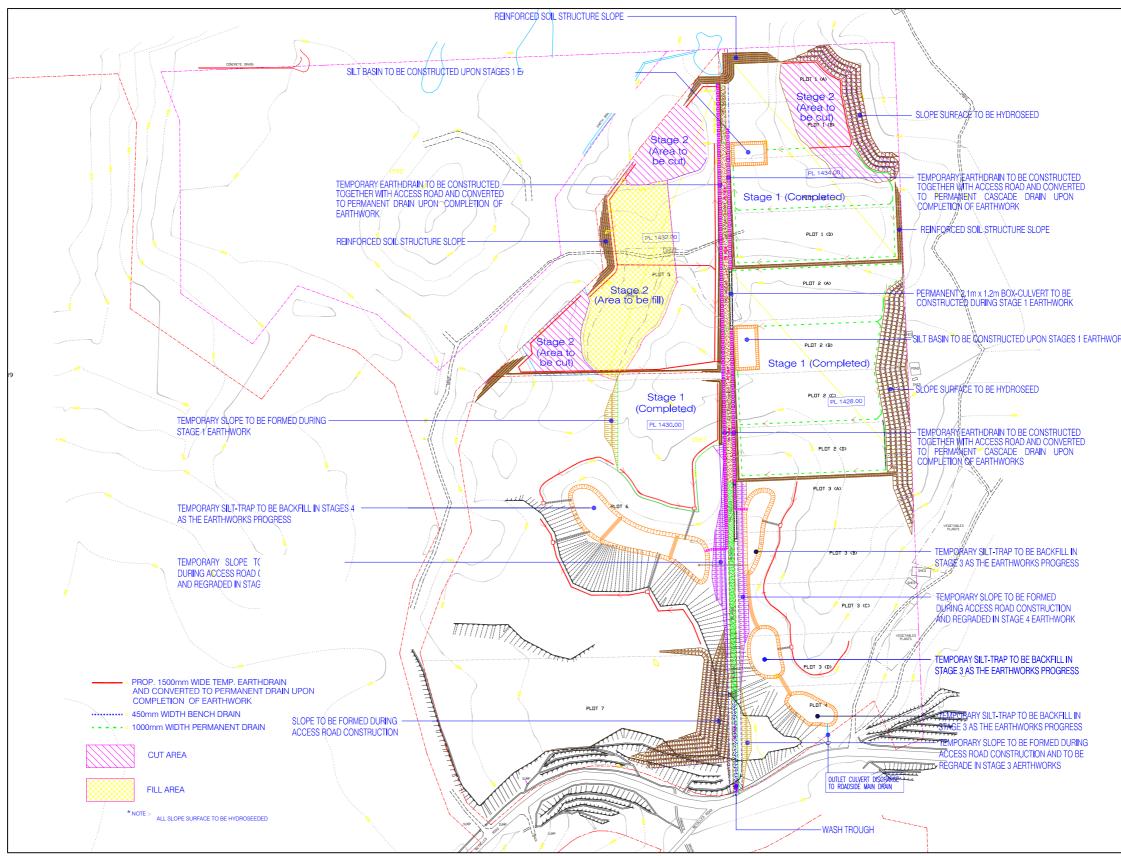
Stage 2 ESC Plan for Proposed Development Area (Deng Seng, 2004).
